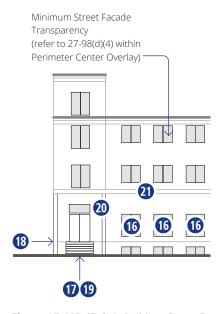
Civic Building: Floor-to-Floor Height & Use Requirements
